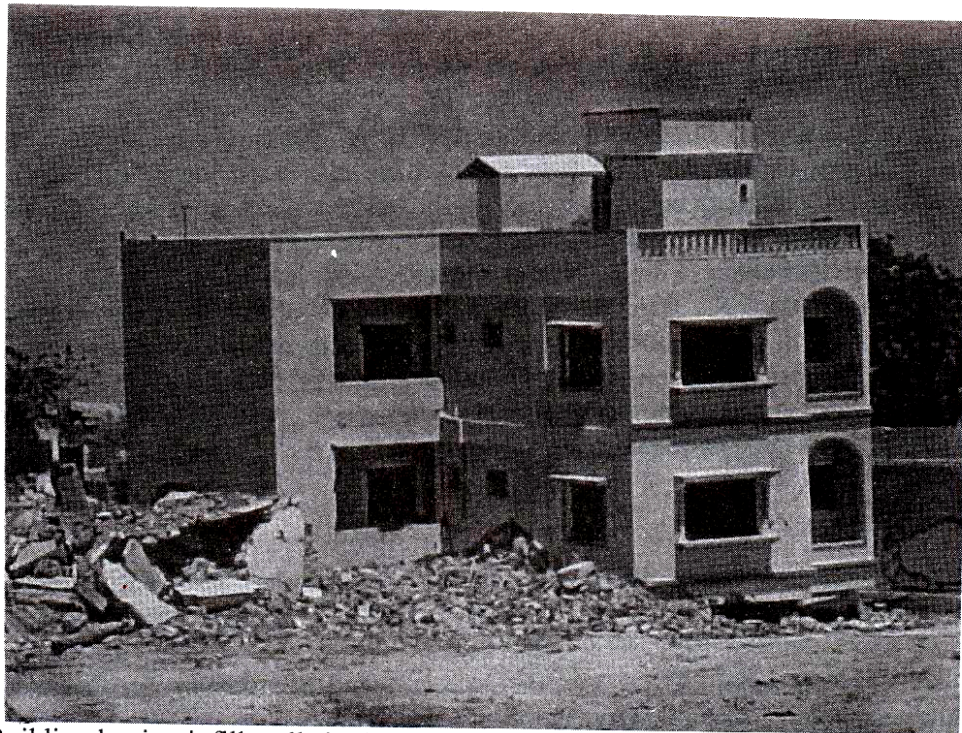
Building having infill walls in the upper storeys with the open ground storey collapsed.
